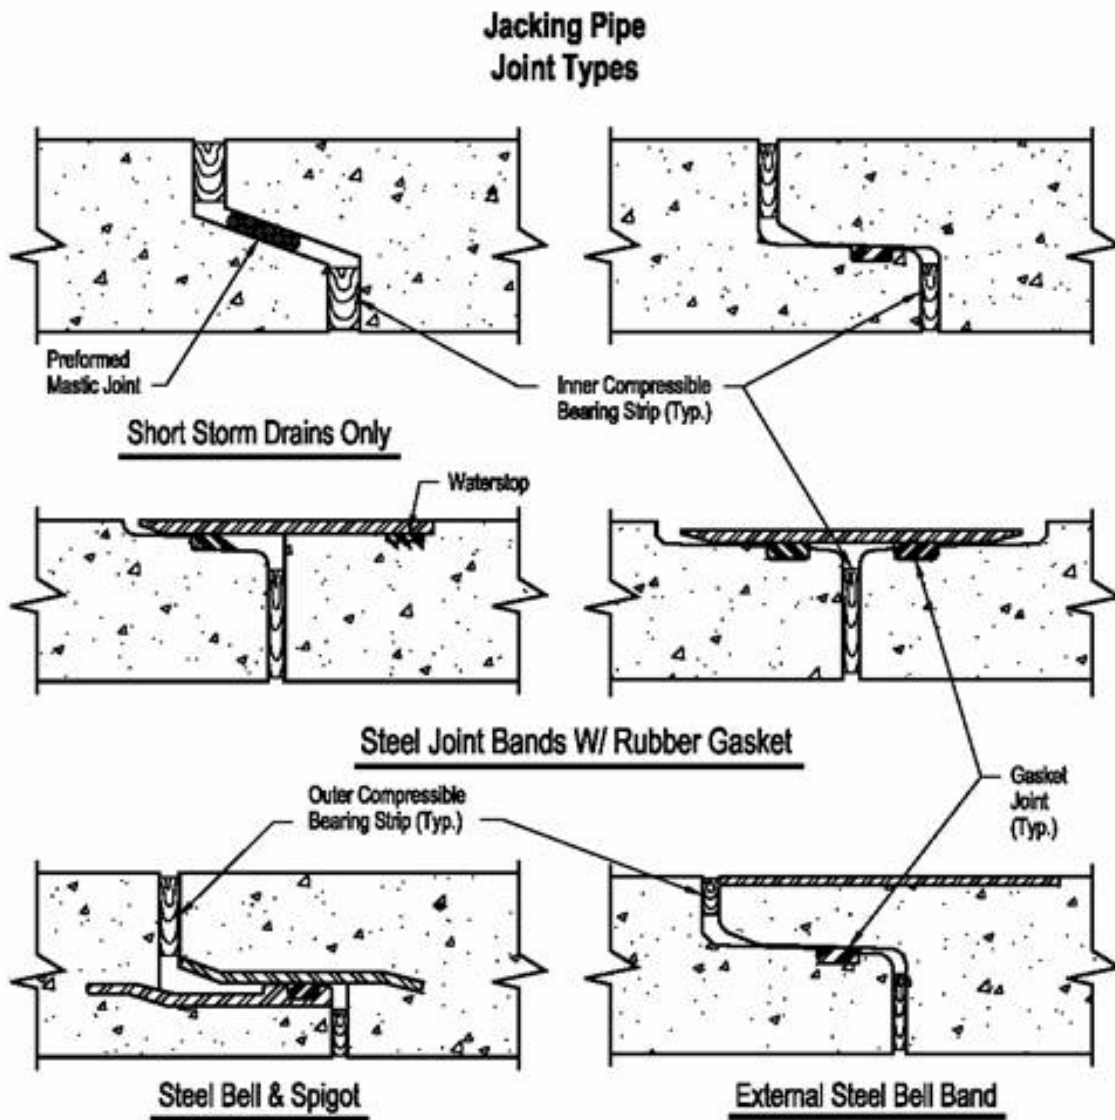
Typical Concrete Jacking Pipe Joint Details
